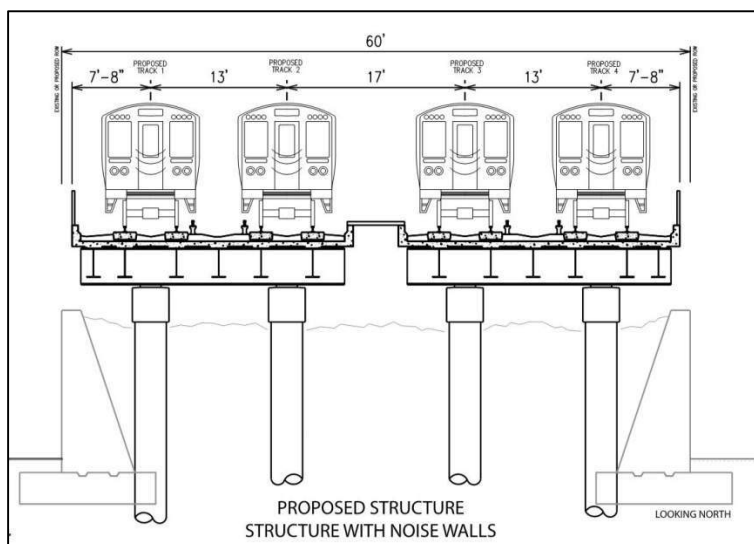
Cross-sectional sketch of track improvements between station areas
